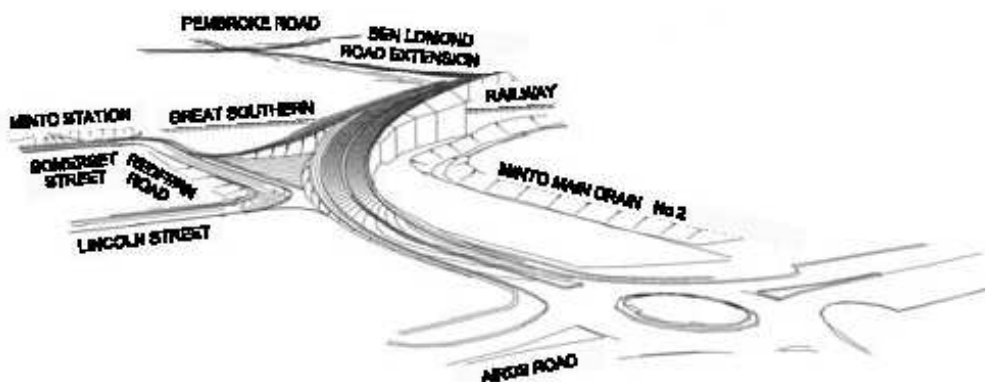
Layout of the road embankments for the Railway Overpass at Minto, NSW.
